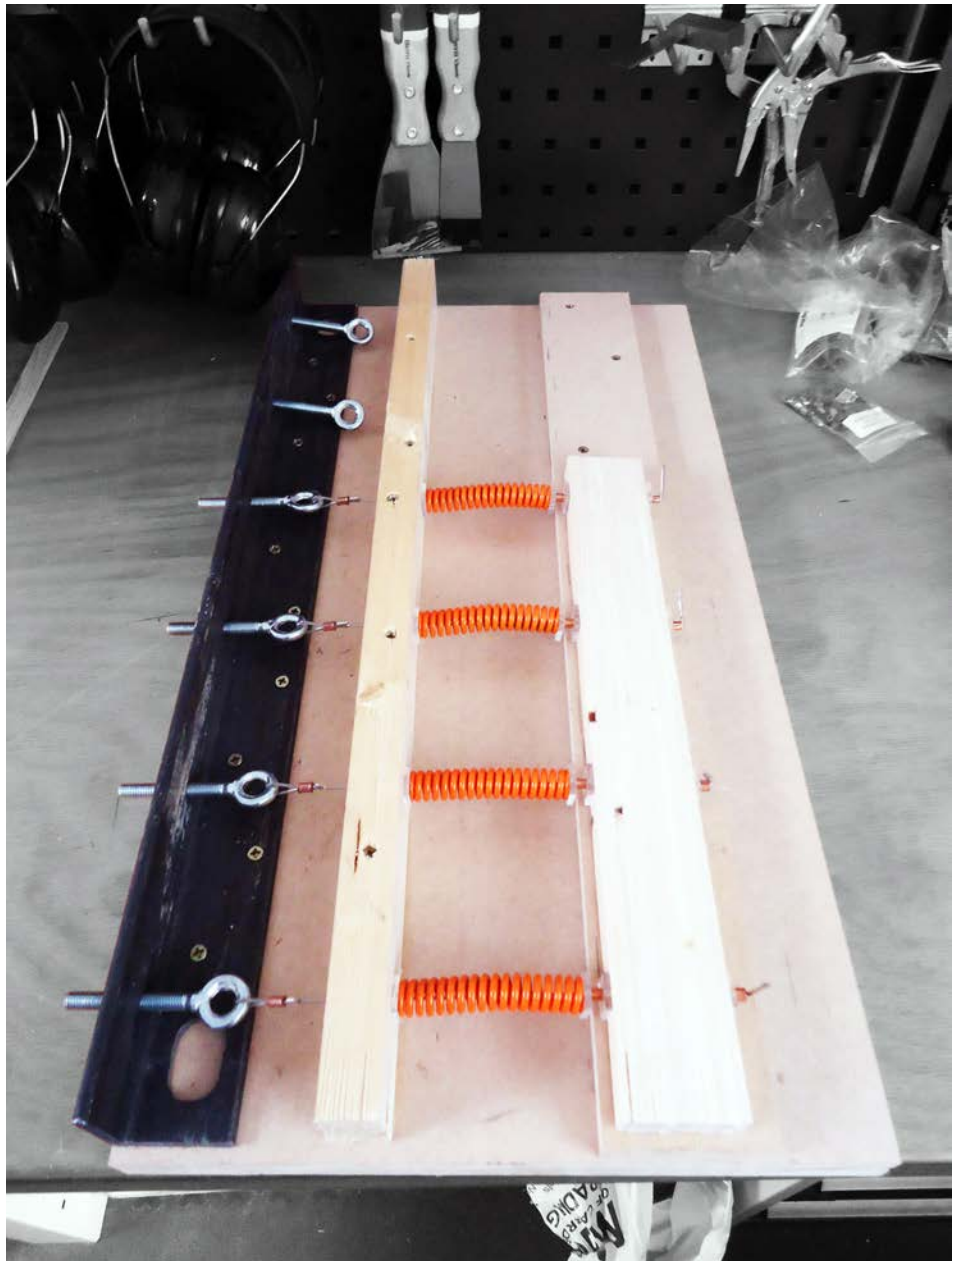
Model of a stress-laminated deck or floor panel at a scale of 1:10.
